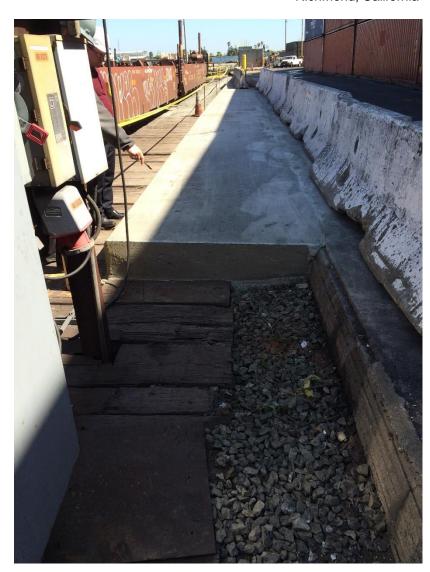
Looking north, along western alley of secondary storage area: new concrete added.
